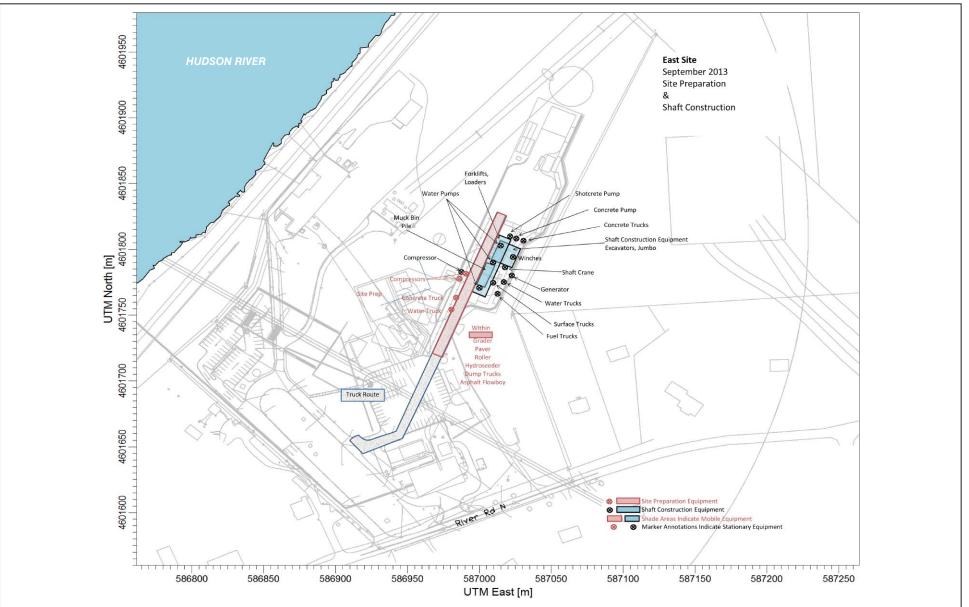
East Connection Site: Phase 1 Site Preparation and Phase 2 Shaft Construction Locations of Equipment
